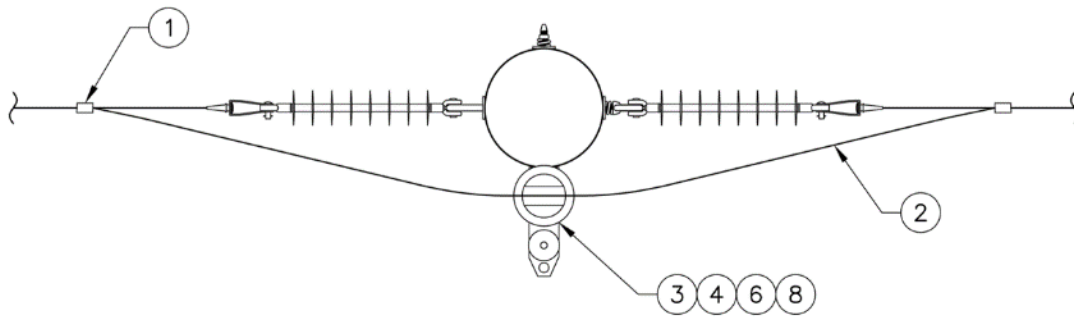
Single-Phase Double Deadend 60°–180° Crossarm Jumper, Top View
